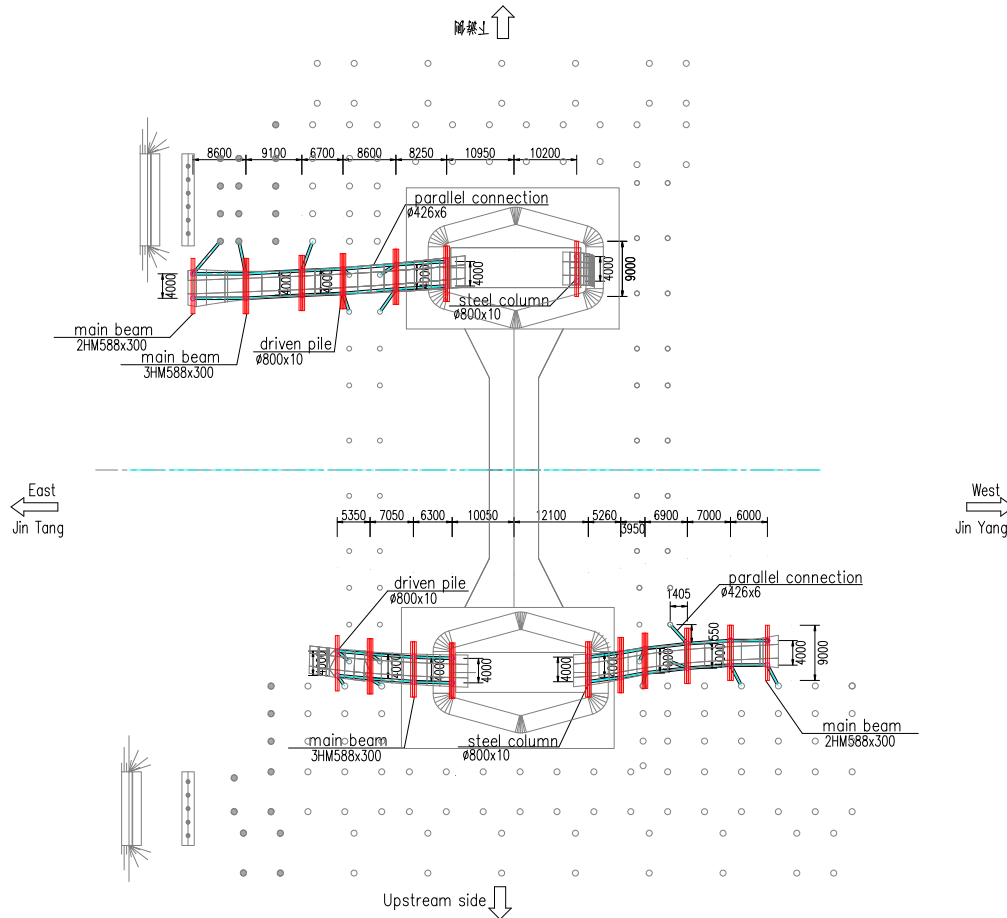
The layout of the assembling support of the V-shaped lower tower columns
